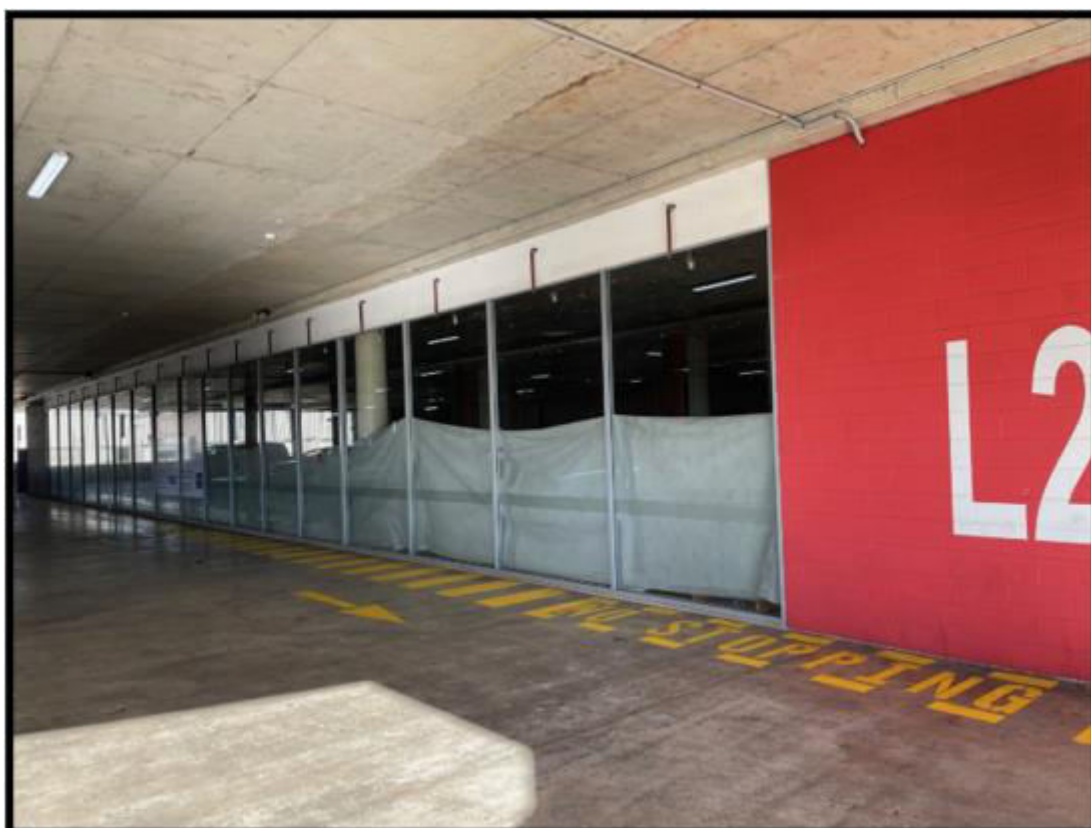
Photo of the vacant space from the second floor - 84D Roberts Avenue, Mortdale
